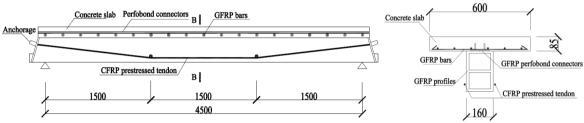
Cross-sections of externally prestressed GFRP-concrete hybrid beam
